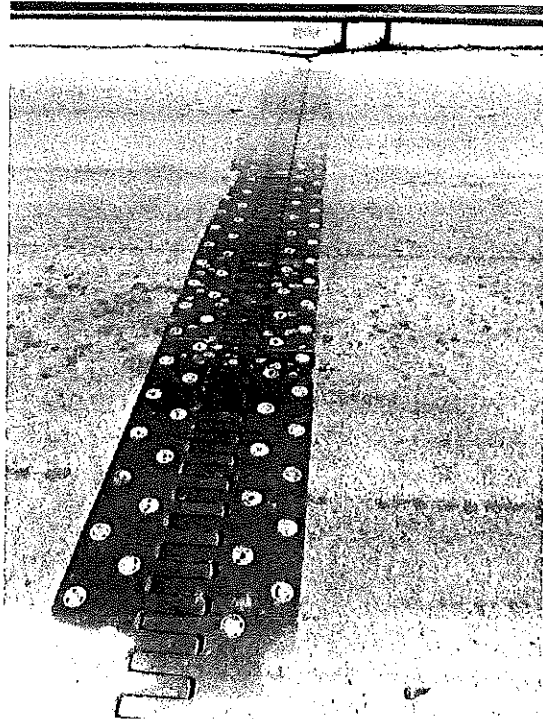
Yapei Bridge. Finger type steel joint in abutments.
